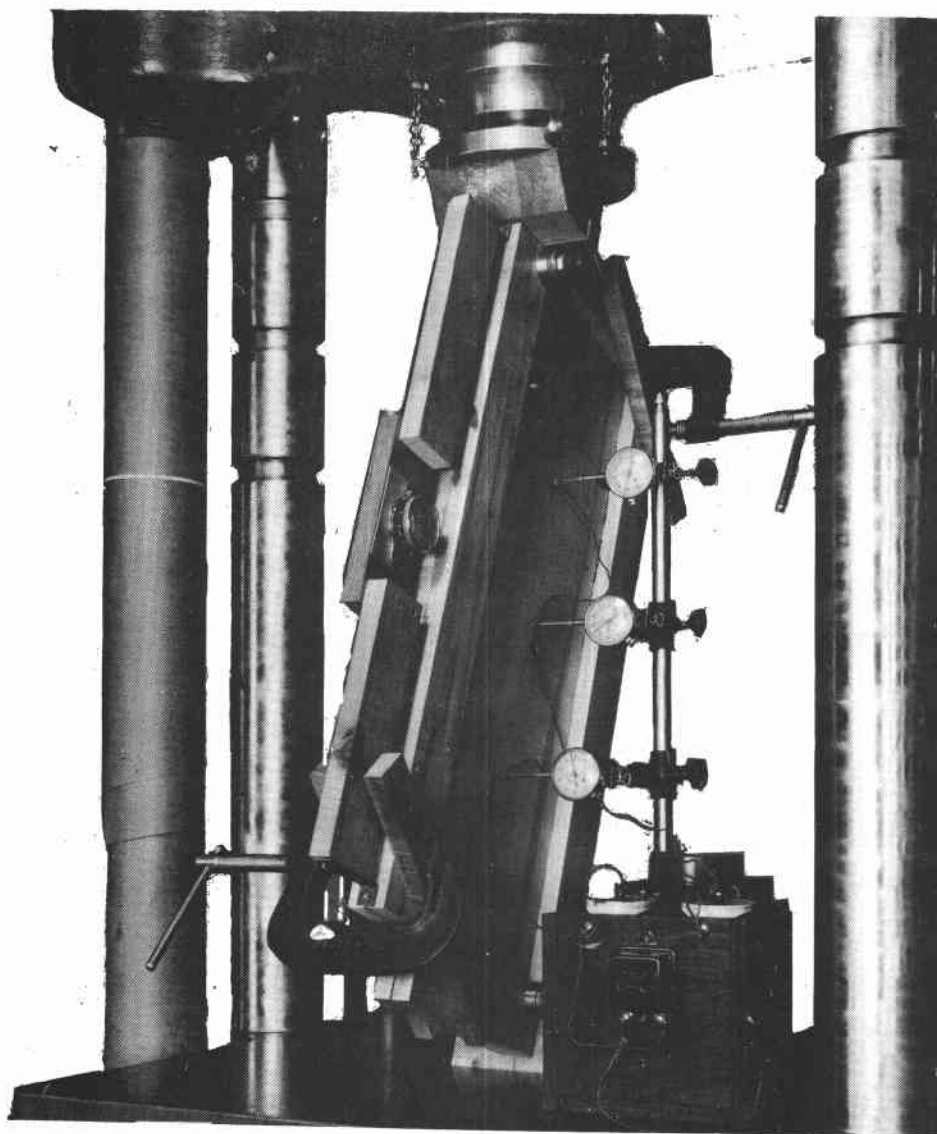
Method used for making shear buckling test, showing lateral and frame gages in place. Diagonal gages not shown.
